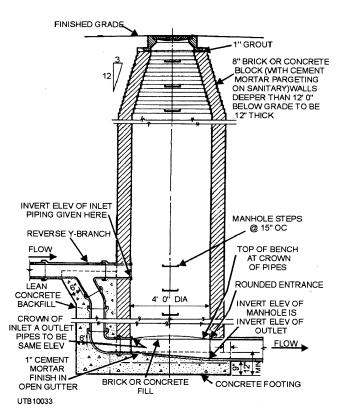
Standard drop manhole for sanitary or storm drainage systems.
